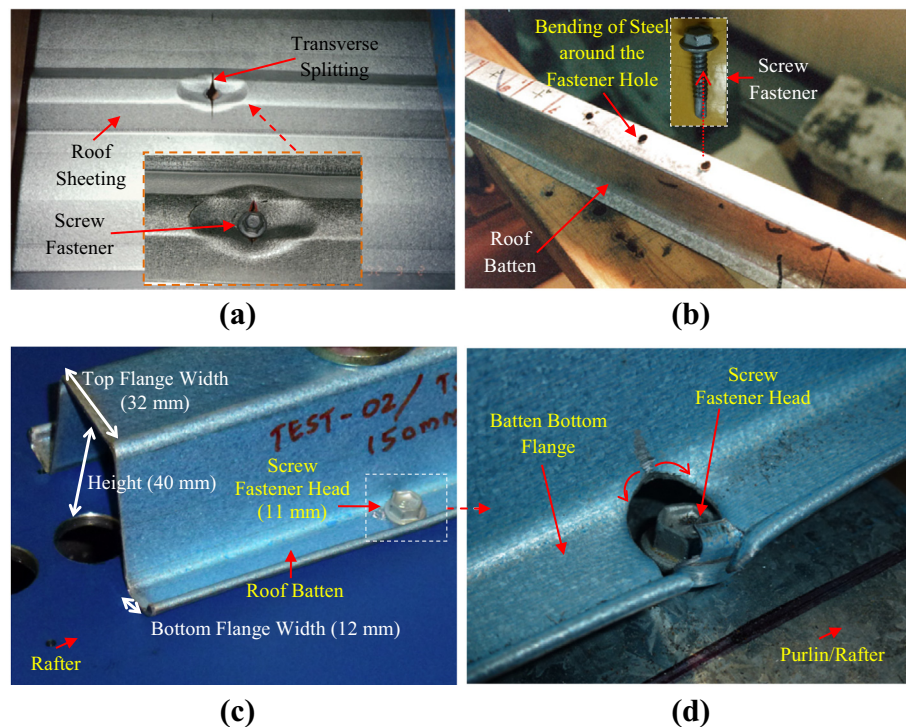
Roof connection failures: (a) Roof sheeting pull-through failures. (b) Pull-out failures. (c) Roof batten to rafter connection and (d) Roof batten pull-through failures.
